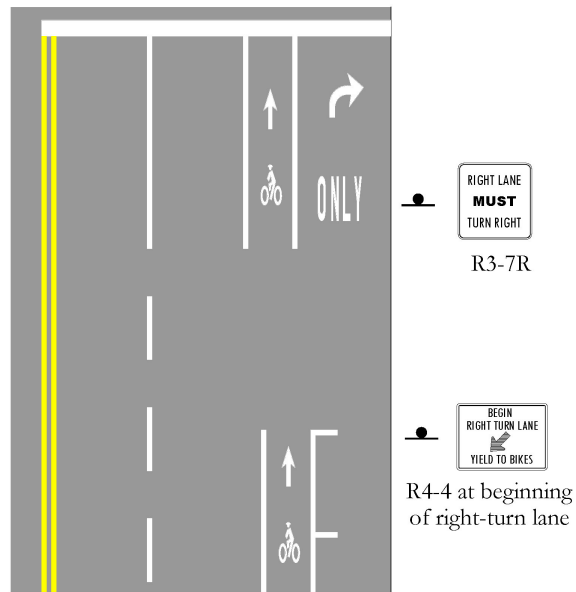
Typical Bike Lane Striping at T-Intersections
